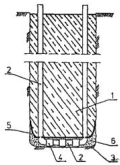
Scheme of base grouting installation: 1 - pile concrete, 2 - grouting tube, 3 - hole bottom, 4 - rubber sleeve, 5 - plastic membrane, 6 - grout
